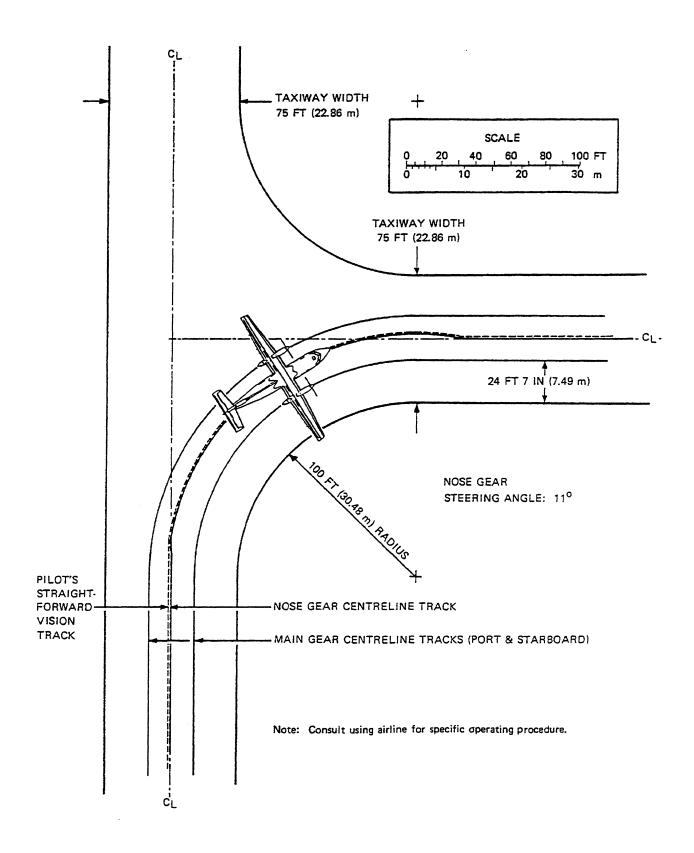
90° Turn-Taxiway to Runway with Nose Gear and Cockpit Tracks
